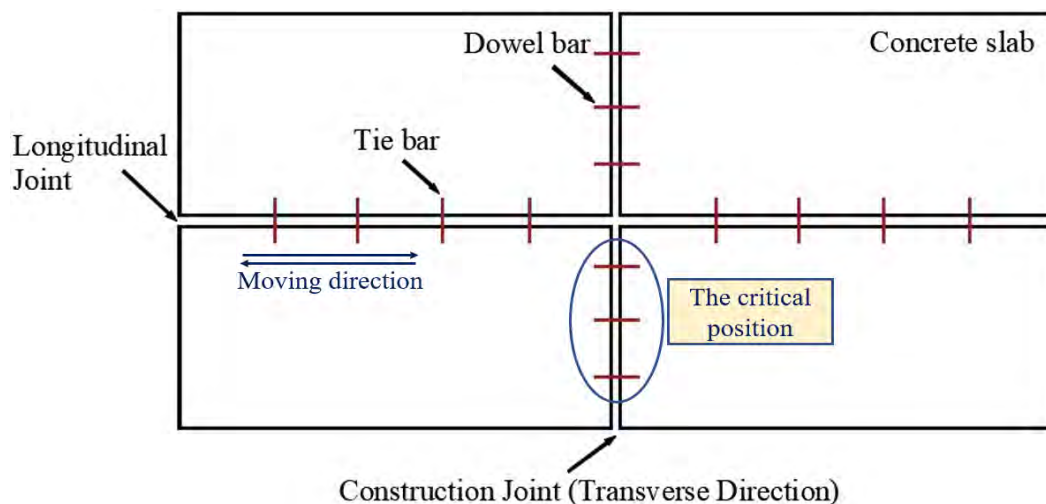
The jointed concrete slab in the concrete pavement.
